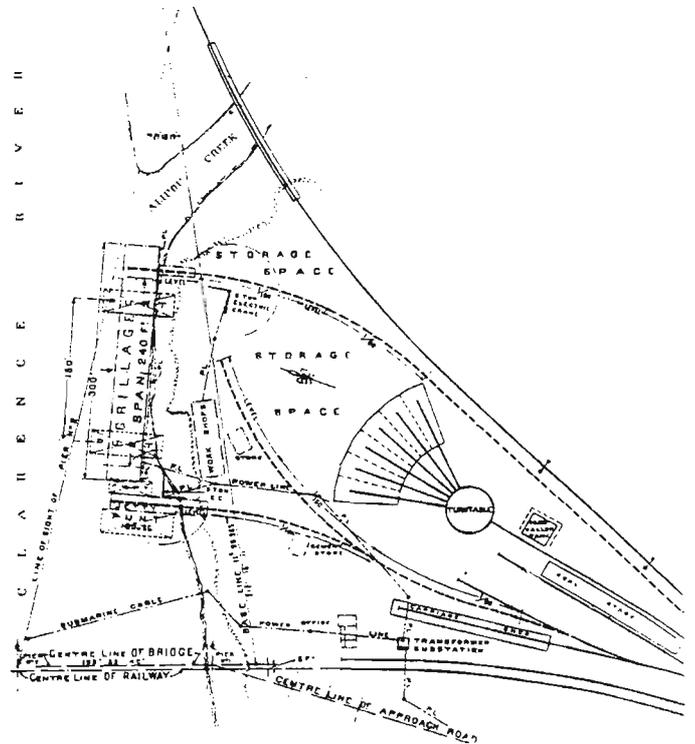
Depot Site: Layout of Construction Buildings, Sidings and Plant.
